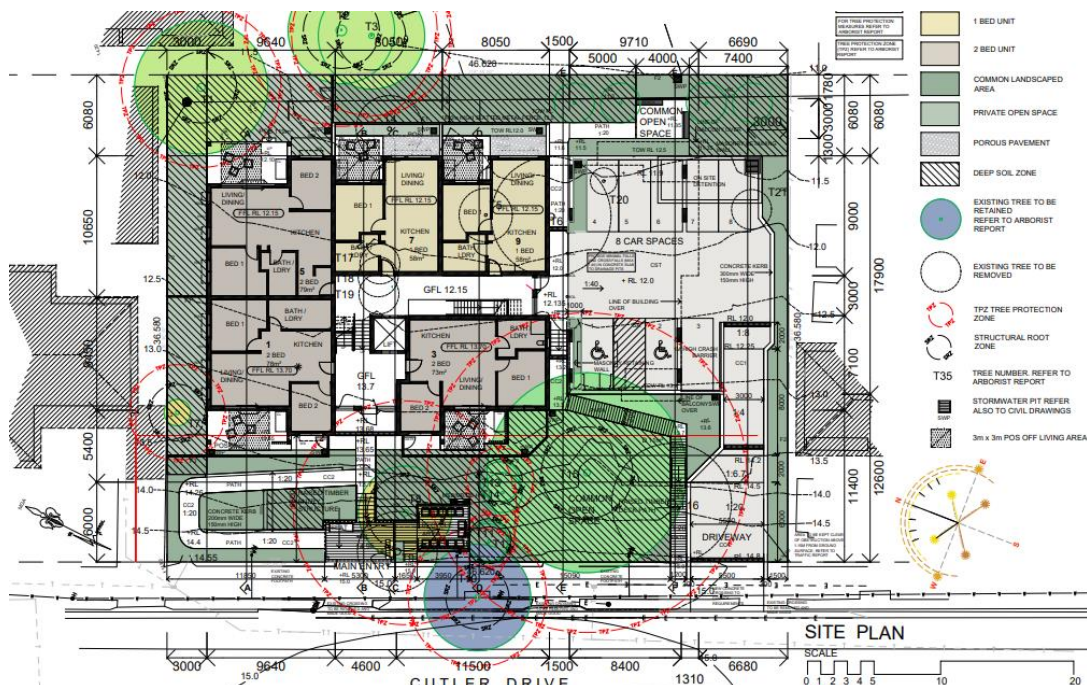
Site/Ground Floor Plan, Source: Barry Rush & Associates Pty
